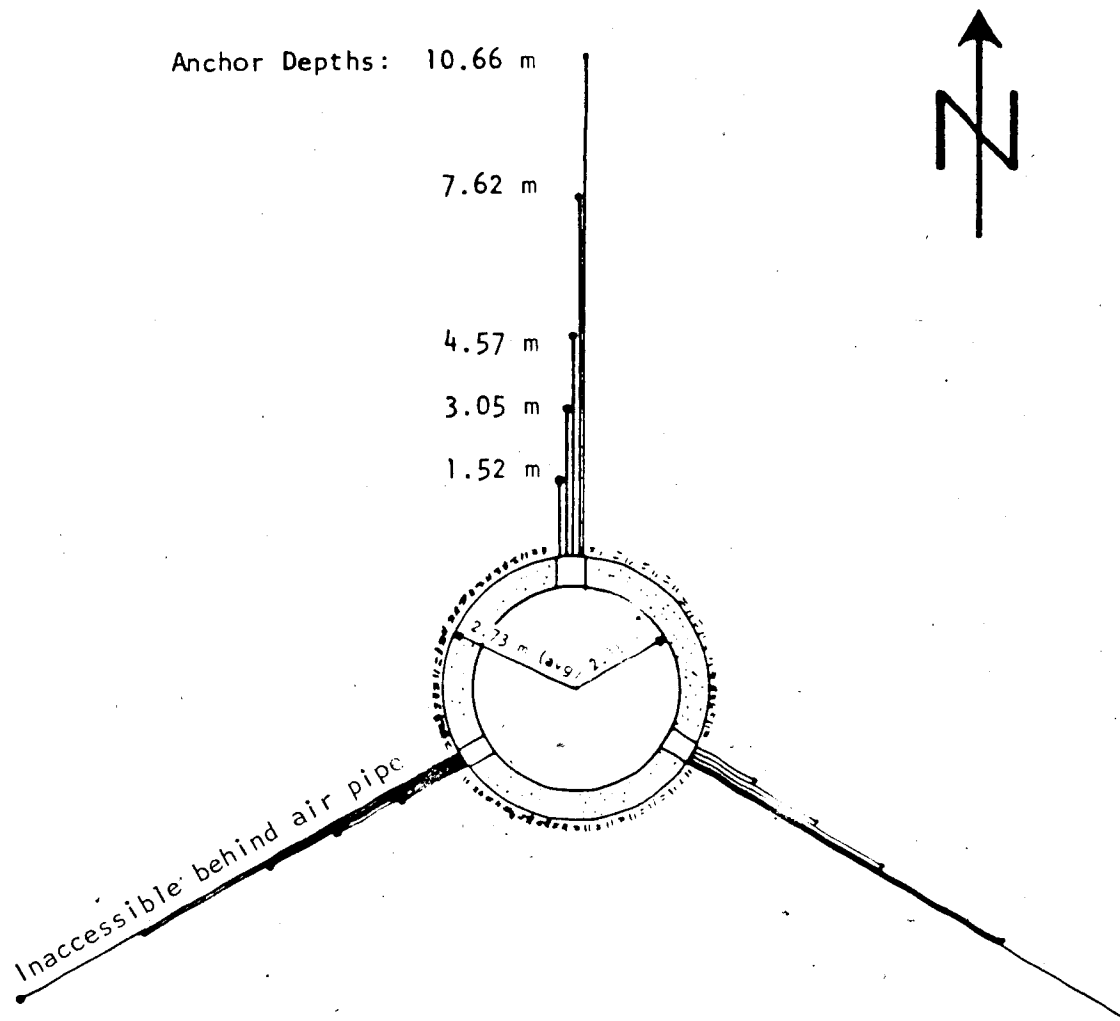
Plan View of Extensometers at 111.3 m Depth
